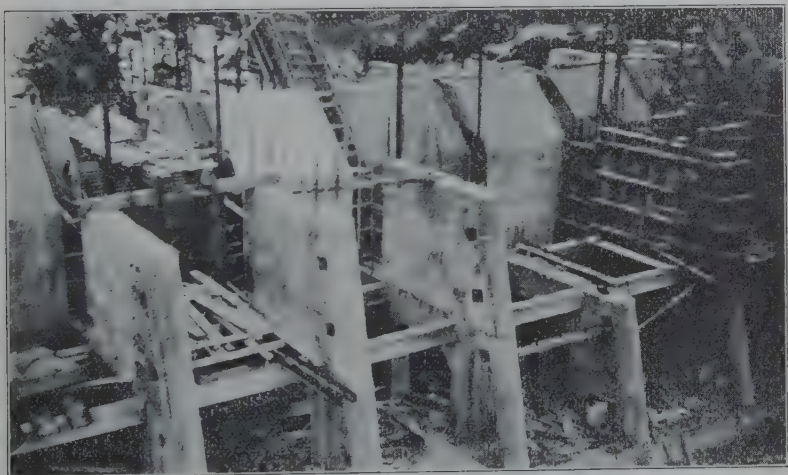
INTAKE SECTION OF DAM UNDER CONSTRUCTION
